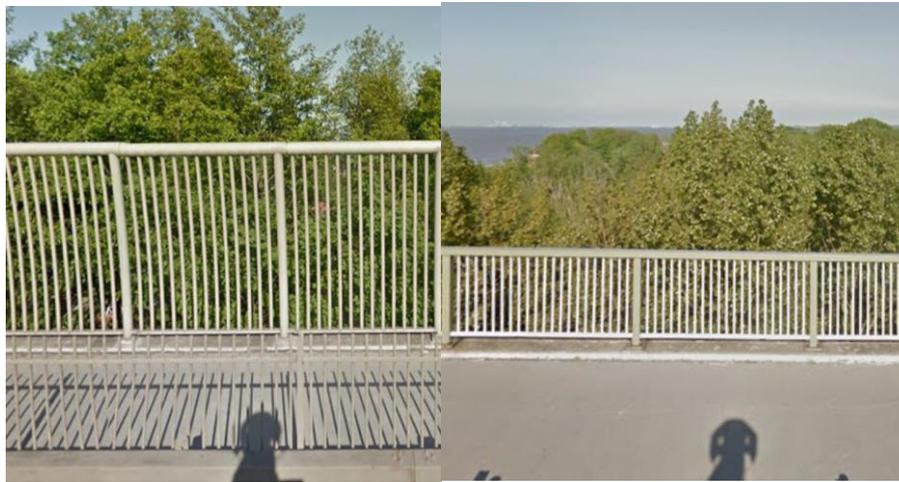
visual comparison of trial barrier (left) to existing parapet (right)
